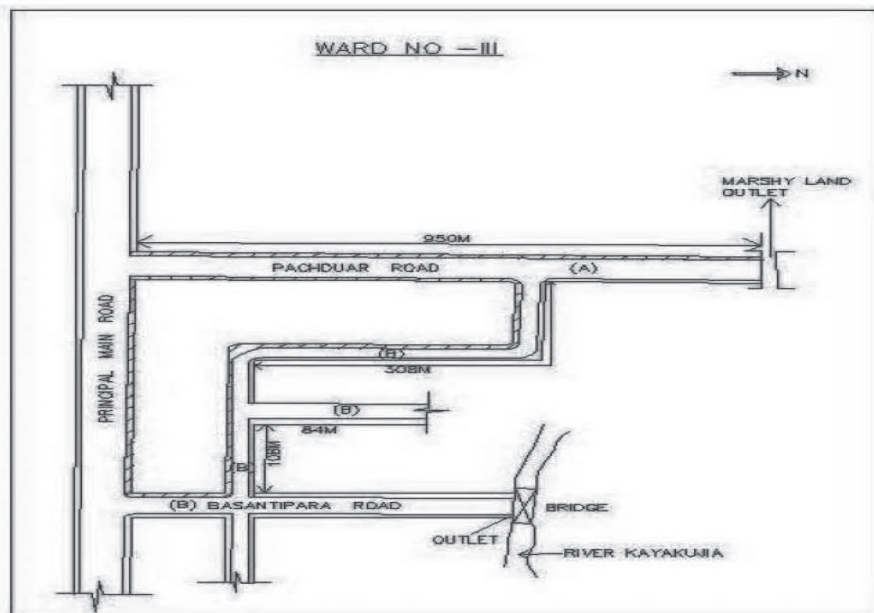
WARD III (Pachduar road to Basantipara road area)
